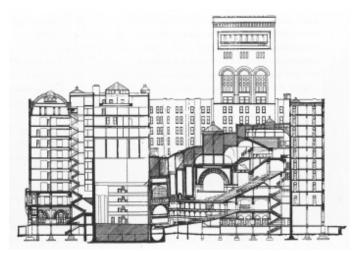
Adler and Sullivan, Auditorium Building, Chicago, 1887 – 1889, Longitudinal Section
